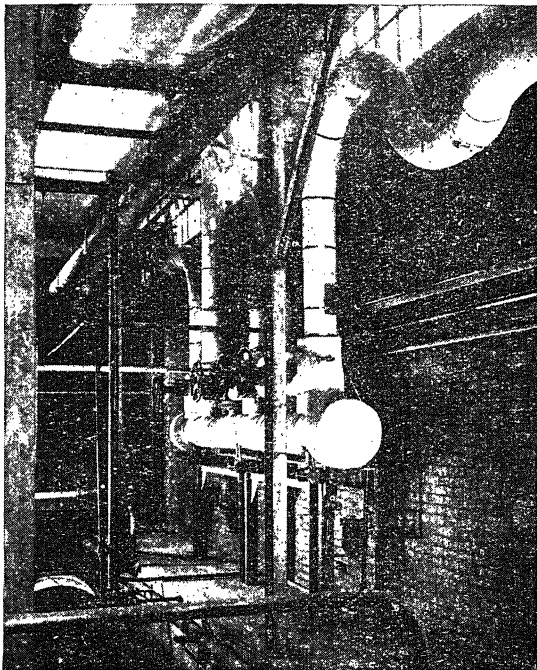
Steam header in industrial plant. (*Courtesy of Valve World.*)
